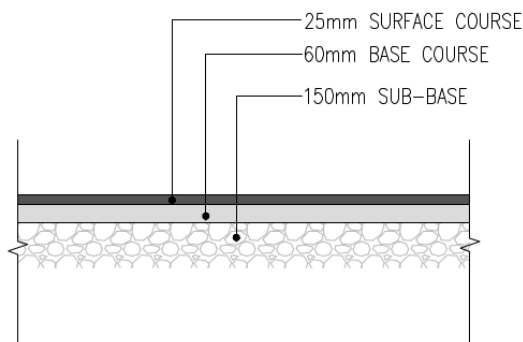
Active travel pavement typical cross section with provision of street lighting (WSP)
